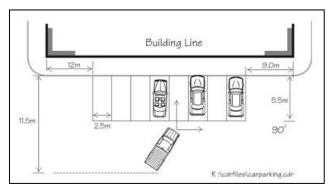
Northern Territory Planning Scheme - Parking Dimensions
